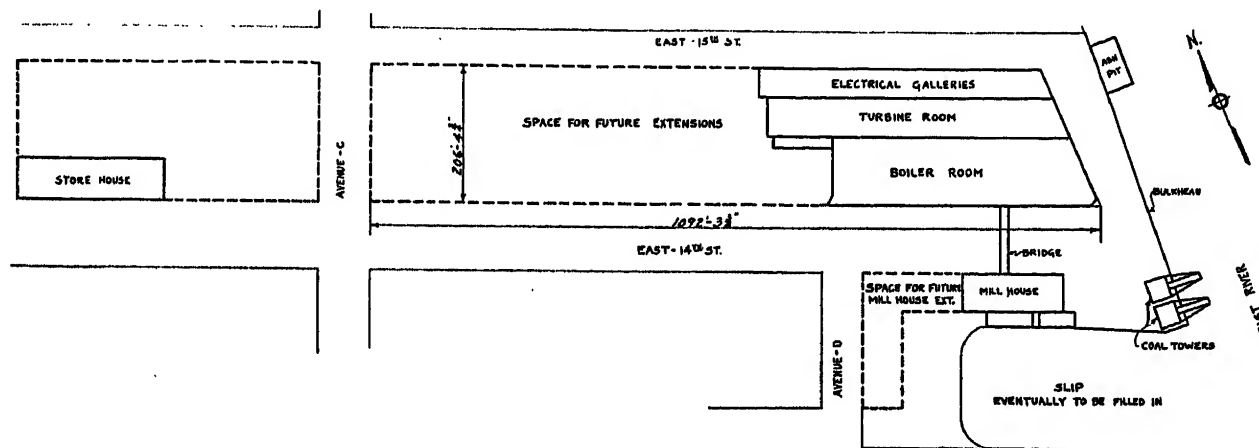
ARRANGEMENT OF BUILDINGS ON SITE
